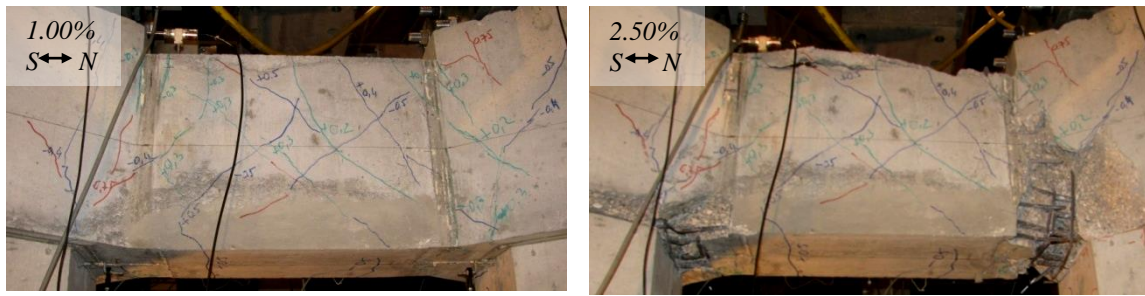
(cont.) – SP_M01 Beam cracking pattern
